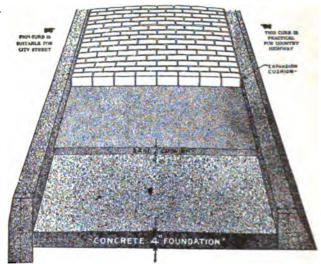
Cross-Section of Street Paved with Brick, as Recommended by the National Paving Brick Manufacturers' Association.
